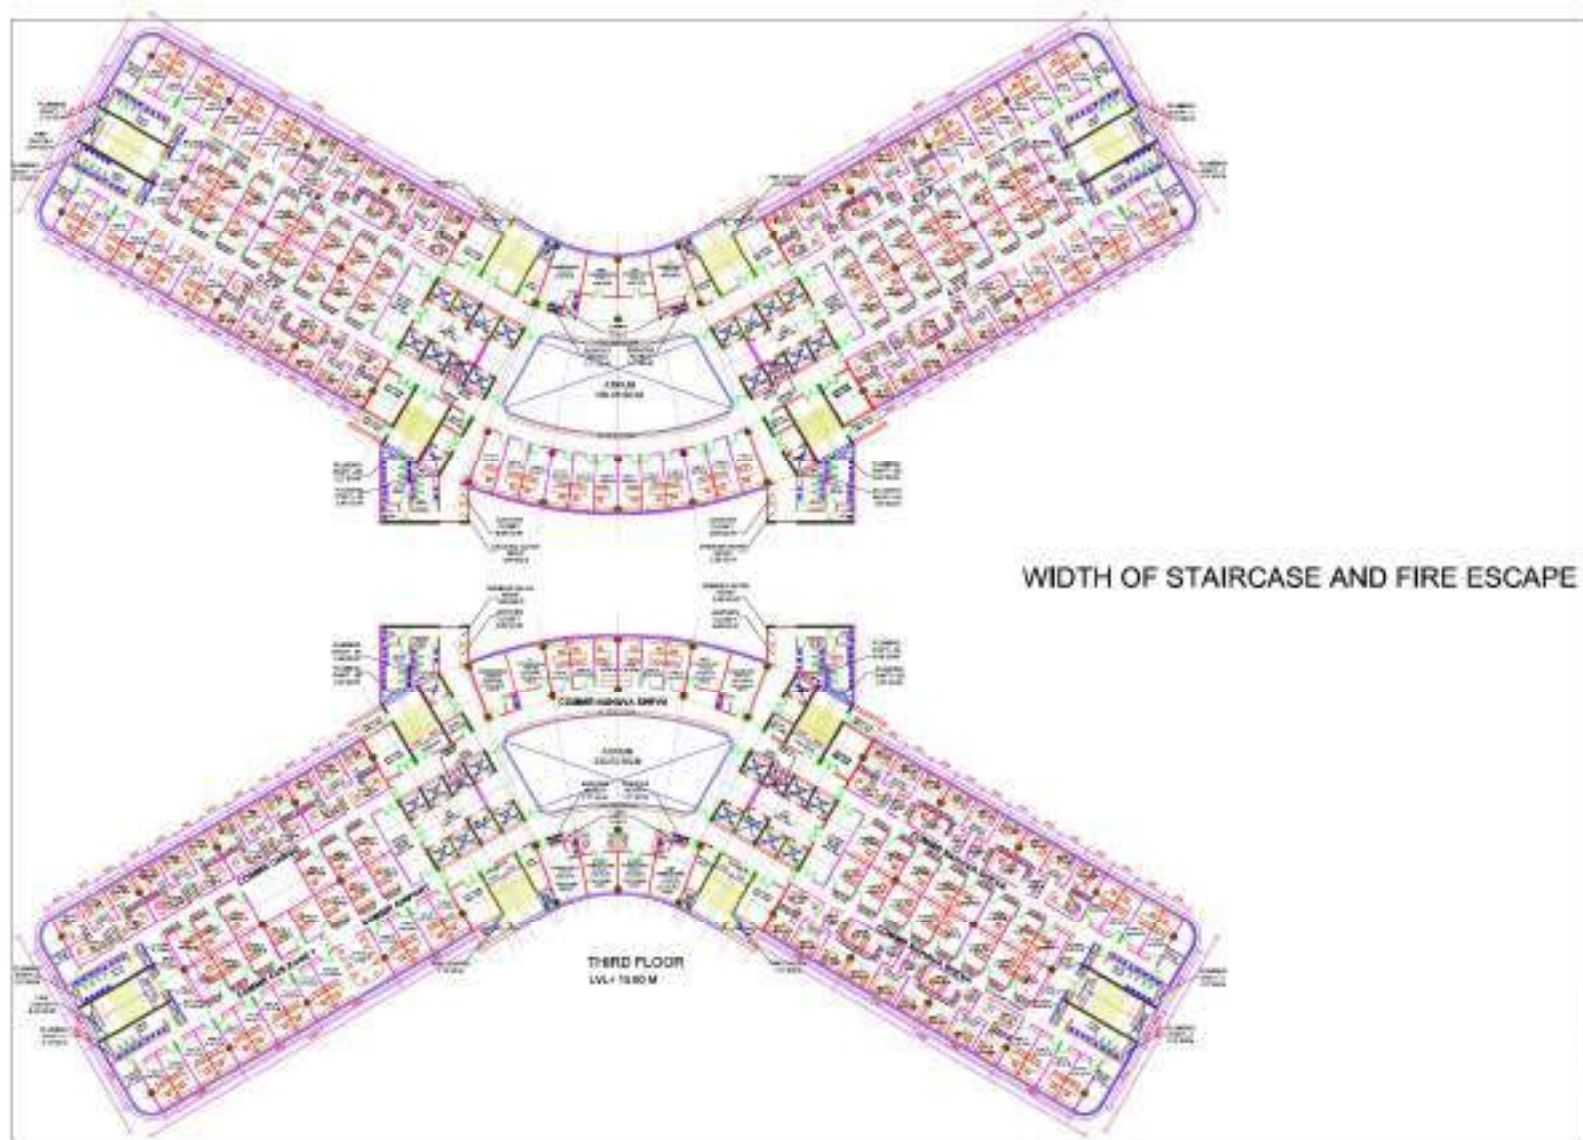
TYPICAL FLOOR PLAN SHOWING WIDTH OF STAIR CASE AND FIRE ESCAPE
